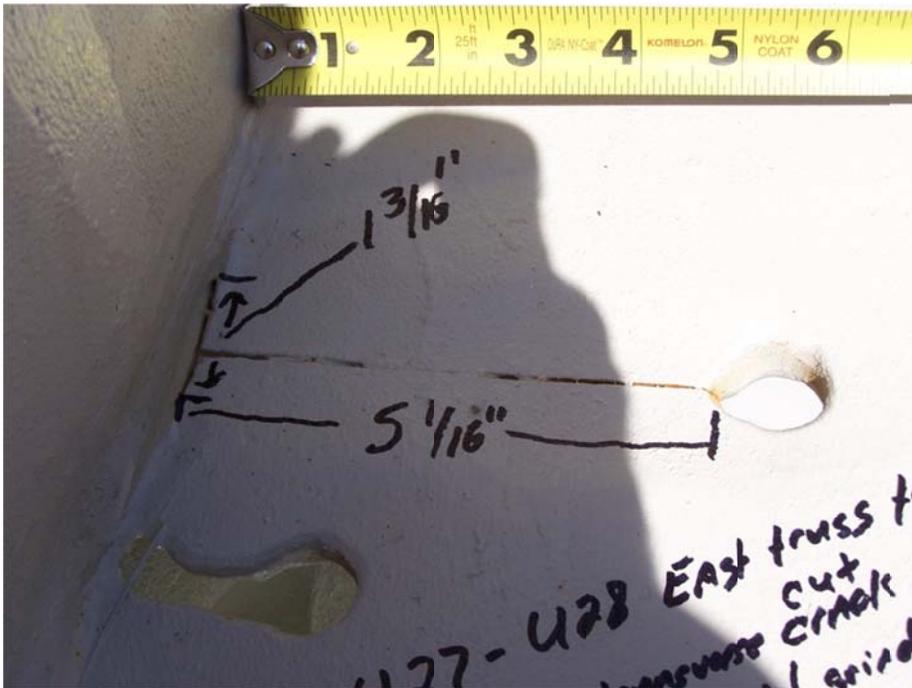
Weld/Crack Repair in H Beam Web Near Panel Point 28 on East Truss.
